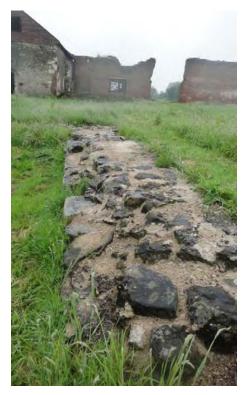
Low wall head remains to South End of Great Hall that have been consolidated with lime mortar that has been degraded by frost action.
